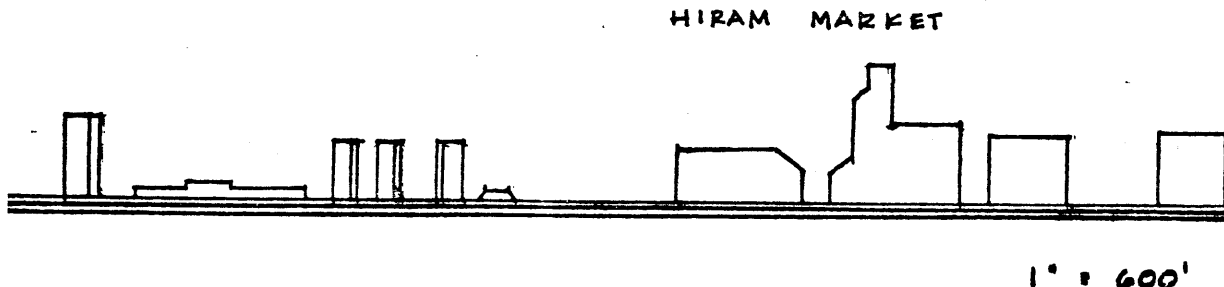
FIGURE VI-E Memorial Parkway Elevation from Commercial Avenue to Washington Street
